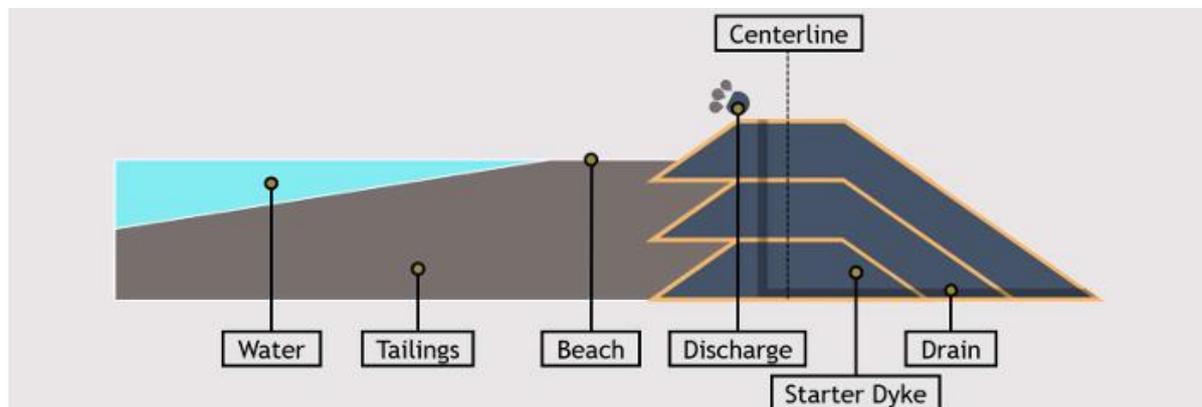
Centreline Tailing Storage Facility design (Yanama Gold, 2023)
